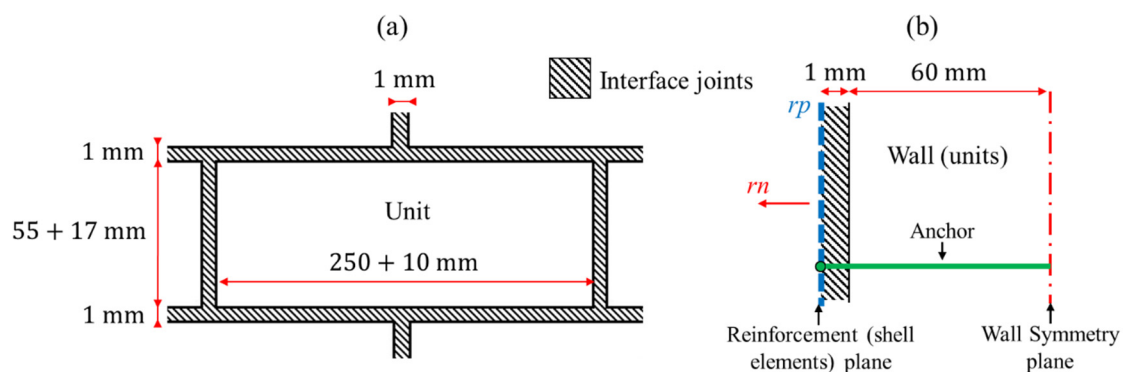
Modelling of (a) masonry wall and (b) wall–reinforcement interaction.
